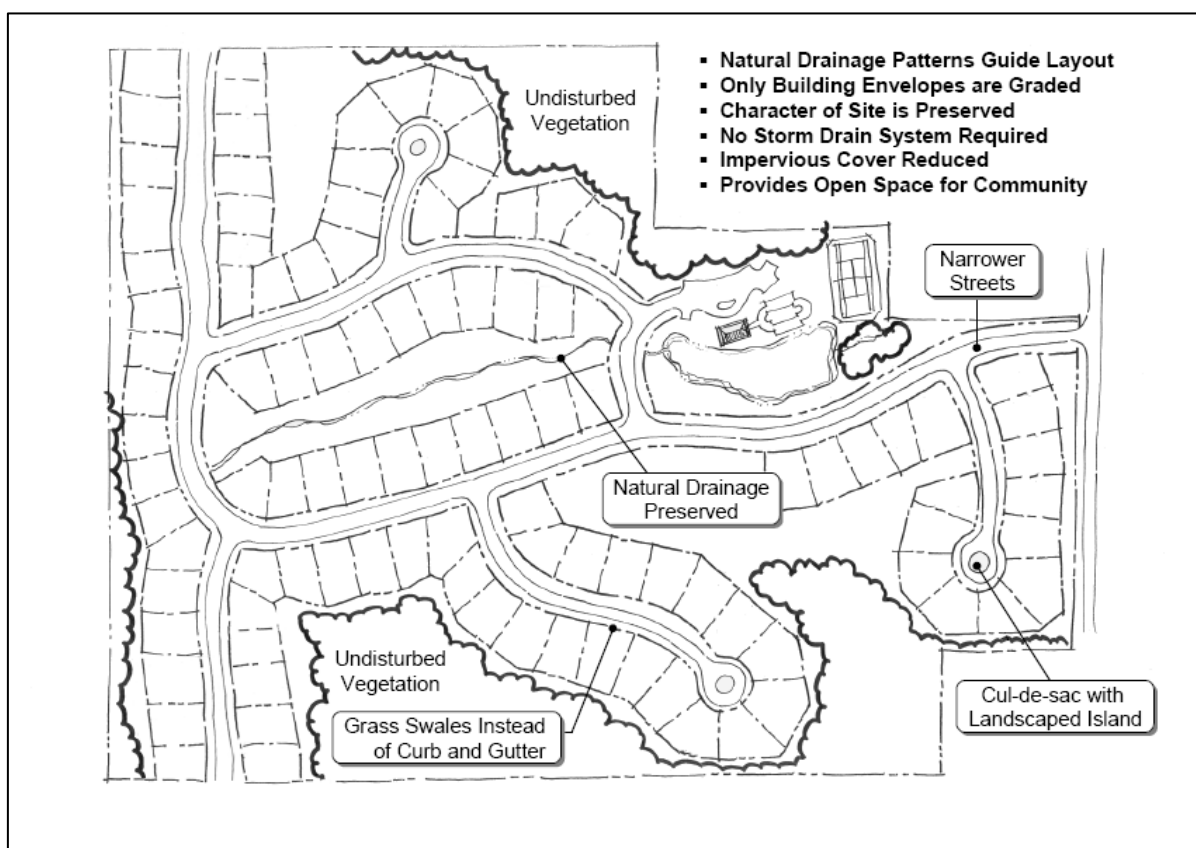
Stormwater Management Concept Plan that Incorporates a Variety of Better Site Planning and Design Techniques
